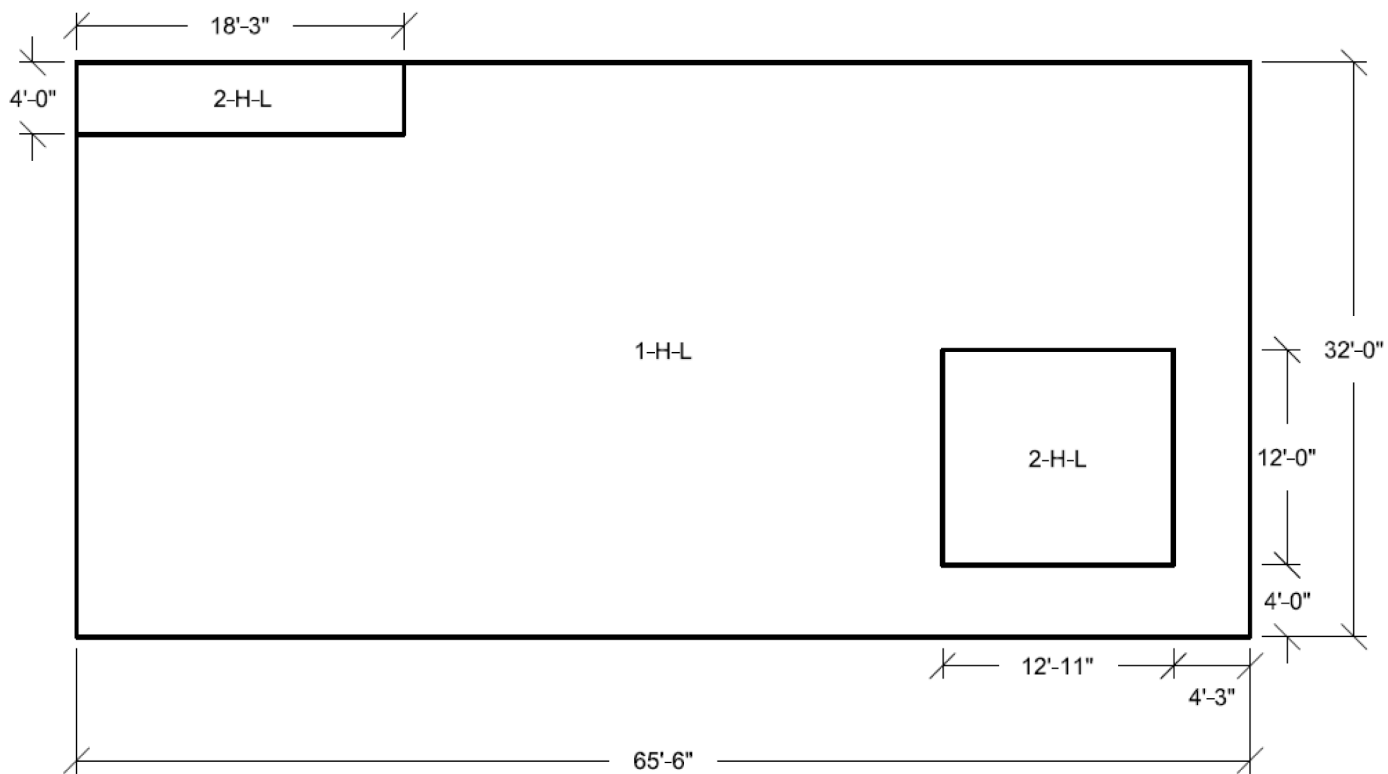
H.6-170 DGFSV Wall 8 Looking From Outside Horizontal Reinforcement Zones Far Side Face
